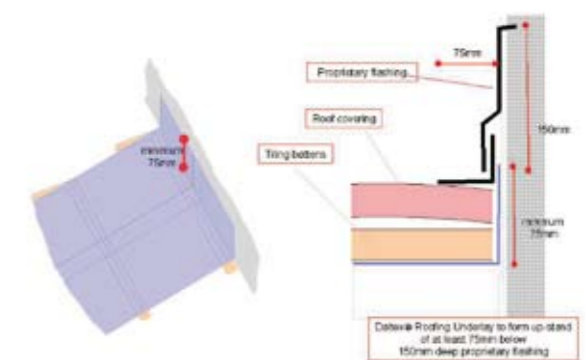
Daltex® Roofing Underlay: Abutment Detail
